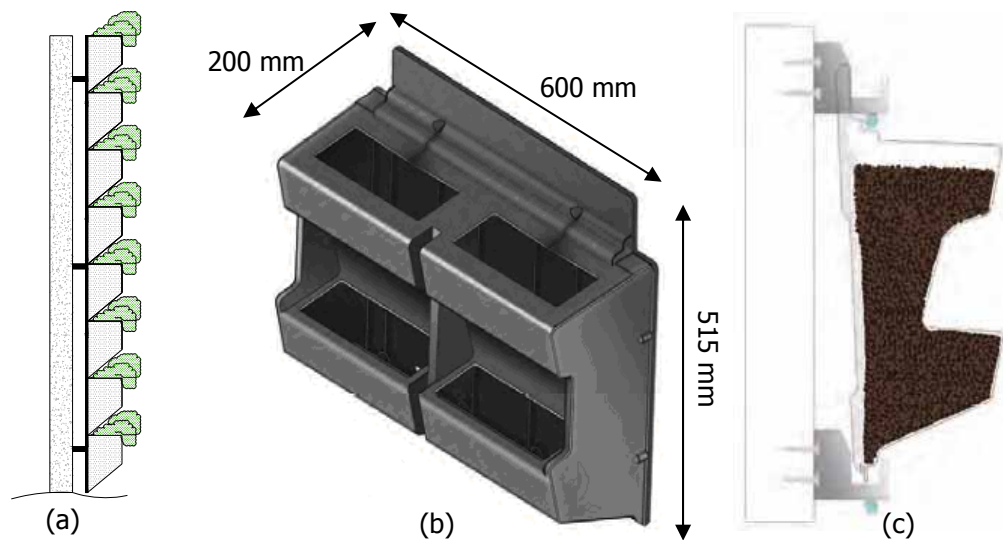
(a) principle of planter boxes, (b) module of planter boxes and (c) the section of a planter box with soil in it (source: www.greenwavesystems.eu).
